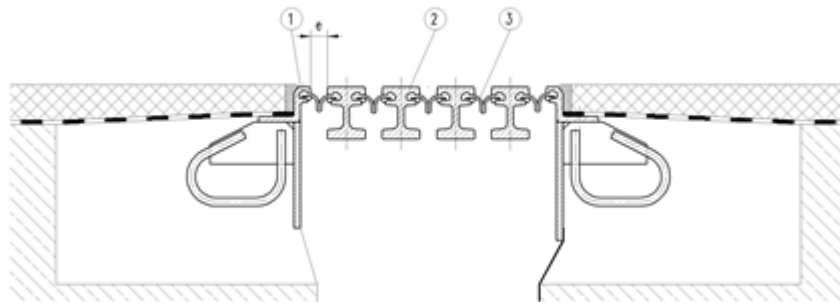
Cross section between crossbeams of multiple crossbeam modular expansion joint with compression control elements at carriageway.
